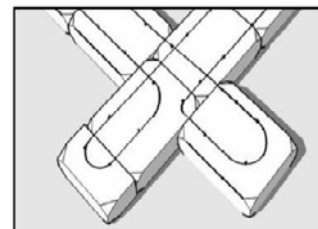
Earthbag wall with barbed wire (Geiger, O. (2015, September))
